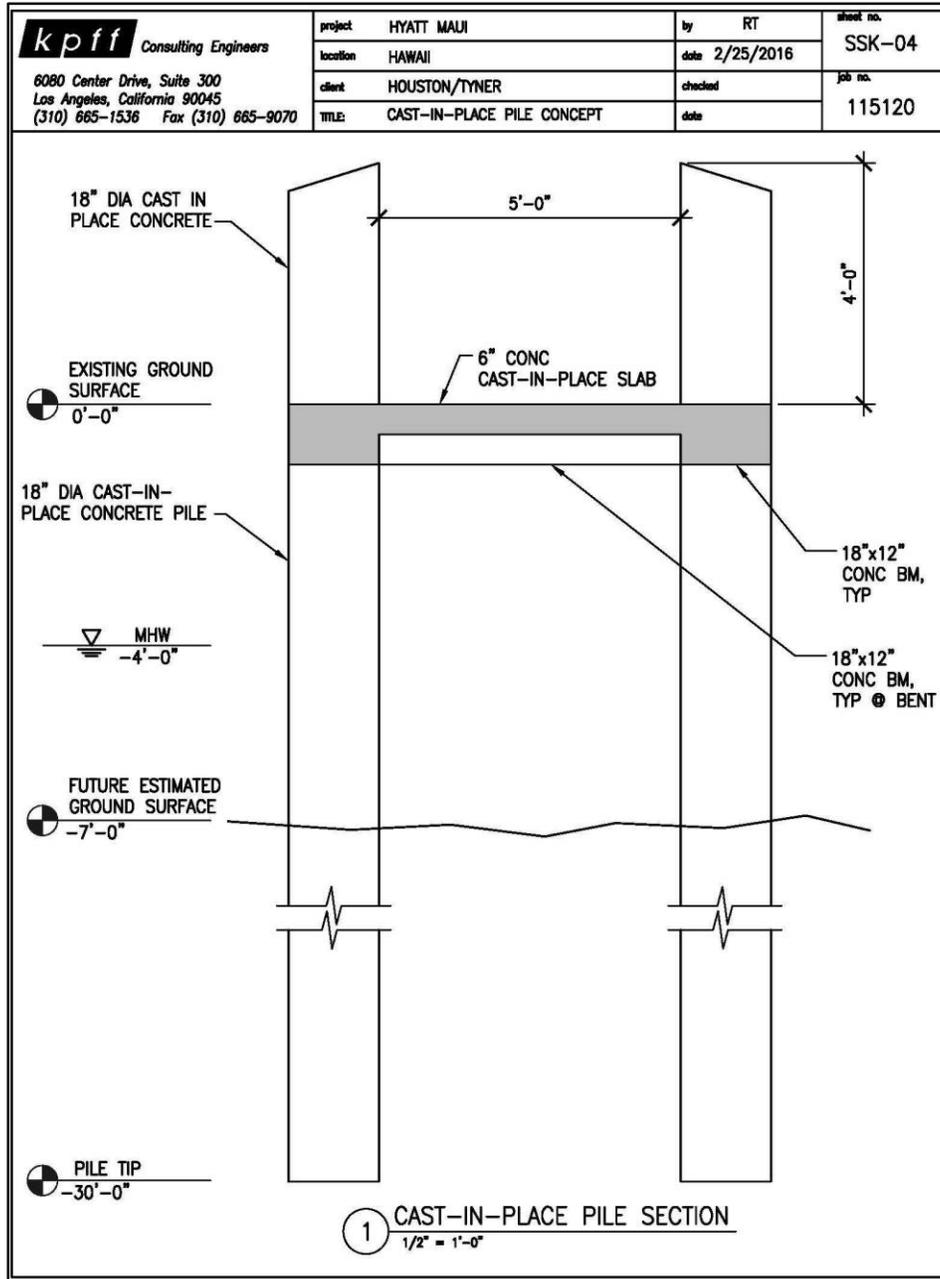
Hyatt boardwalk cross section—cast-in-place concrete pile
